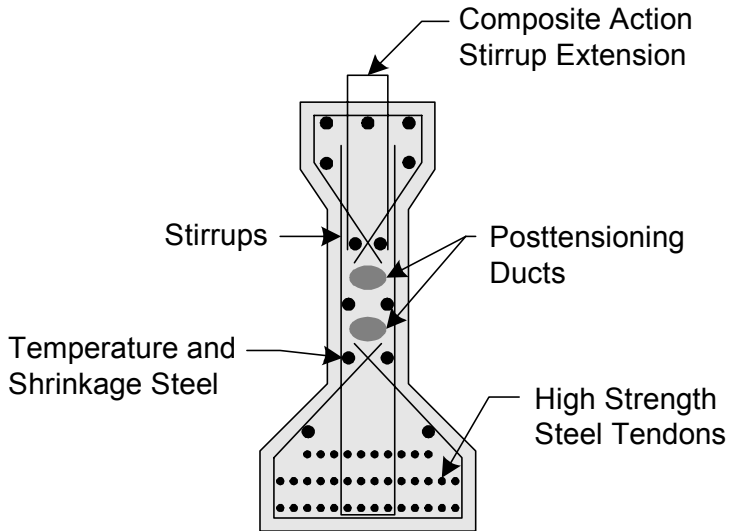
Prestressed I-Beam Reinforcement (Schematic)
